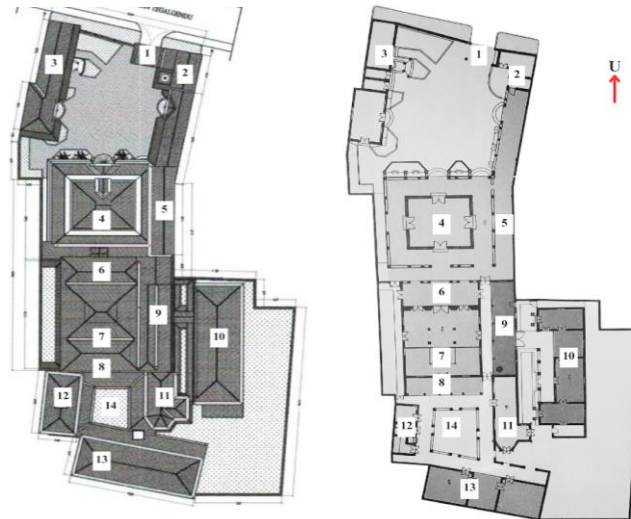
Floor Plan as a House (left) and as a Museum (right)
